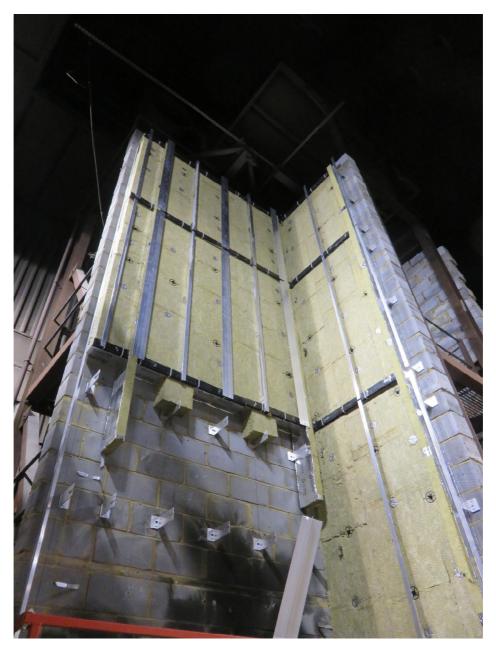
Partial installation of cavity barriers, stone wool insulation and railing substructure.
